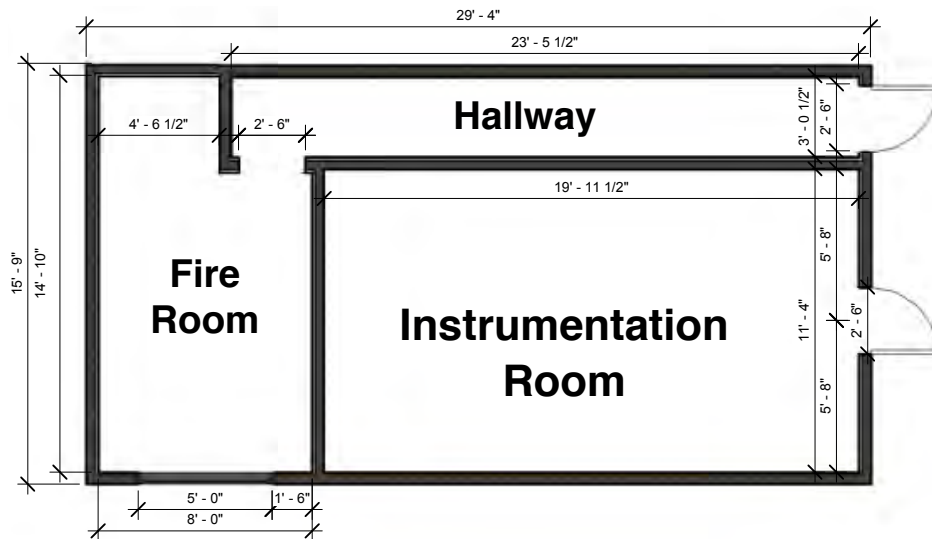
Dimensioned floor plan of the Gypsum Prop.
